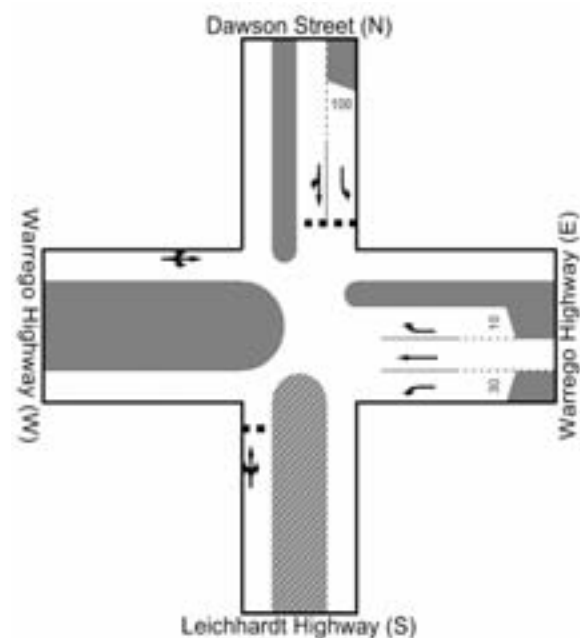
Existing Warrego Highway/Leichhardt Highway/Dawson Street intersection
